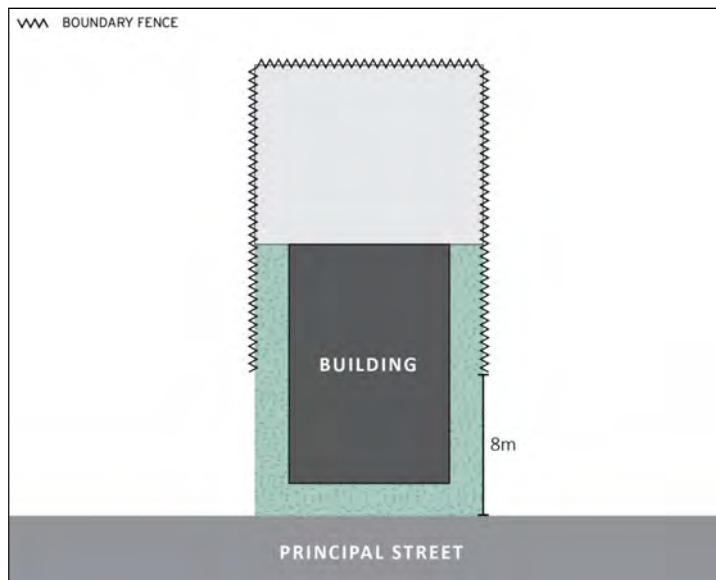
Construction of a new timber paling fence, which is visible from a street, is exempt if located in this area
